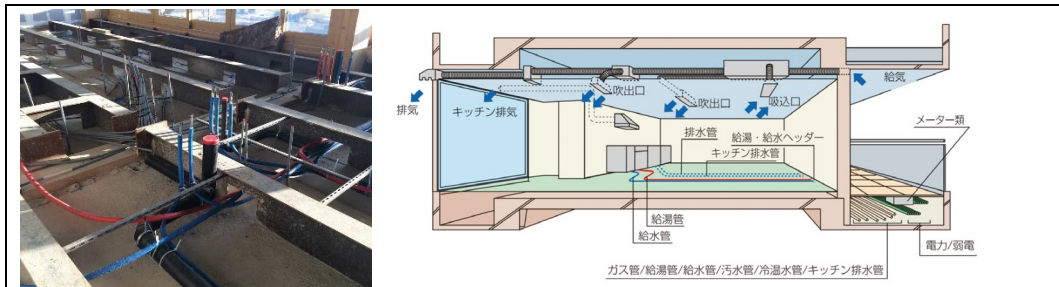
Floor system of Patch 22/Floor system of Next 21
